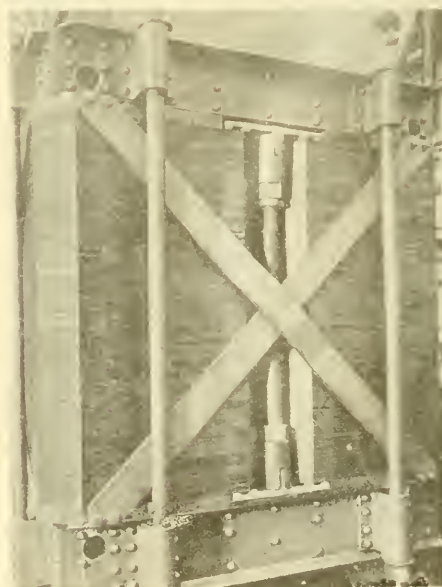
DETAIL VIEW OF DIAGONAL CROSS BRACING
